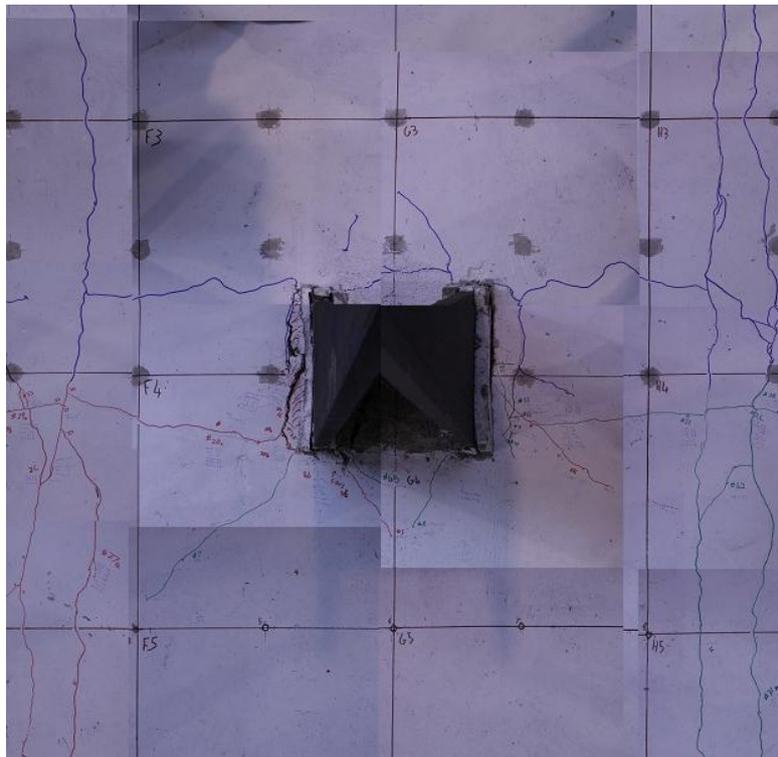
Slab damage in column region after all cycles of test 1.
